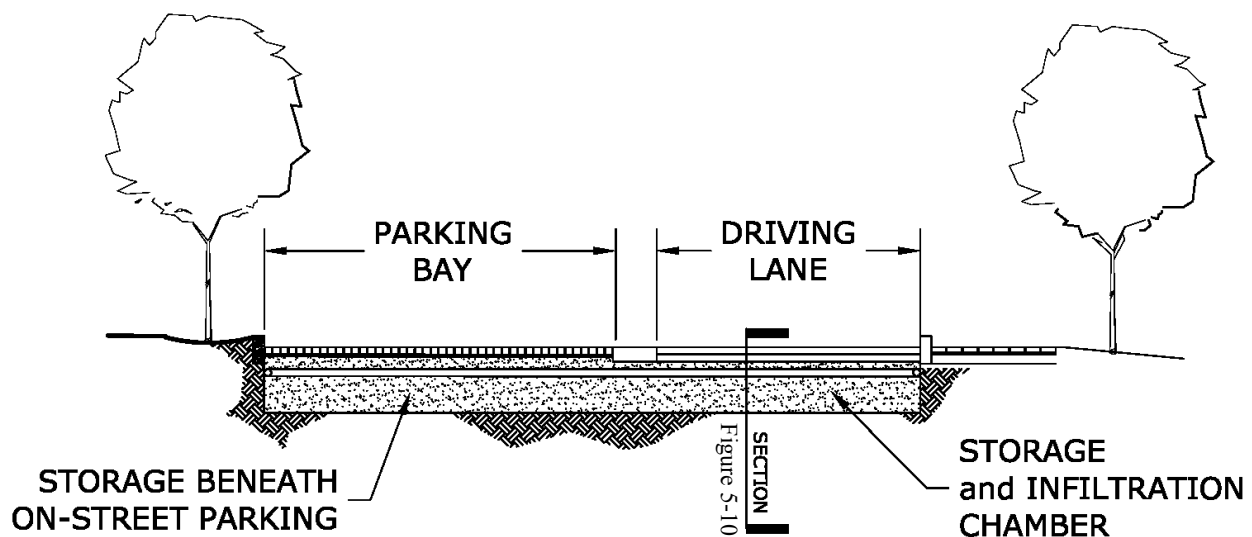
Storage beneath Parking Bays and Driving Lanes
